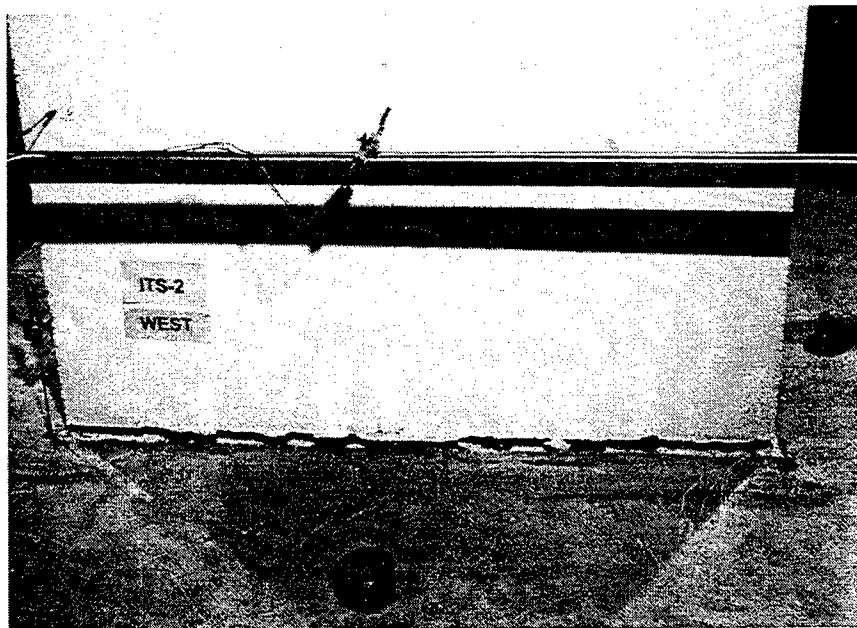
ITS-2 view of west wall, imposed top deflection of 2 in. towards the west.
